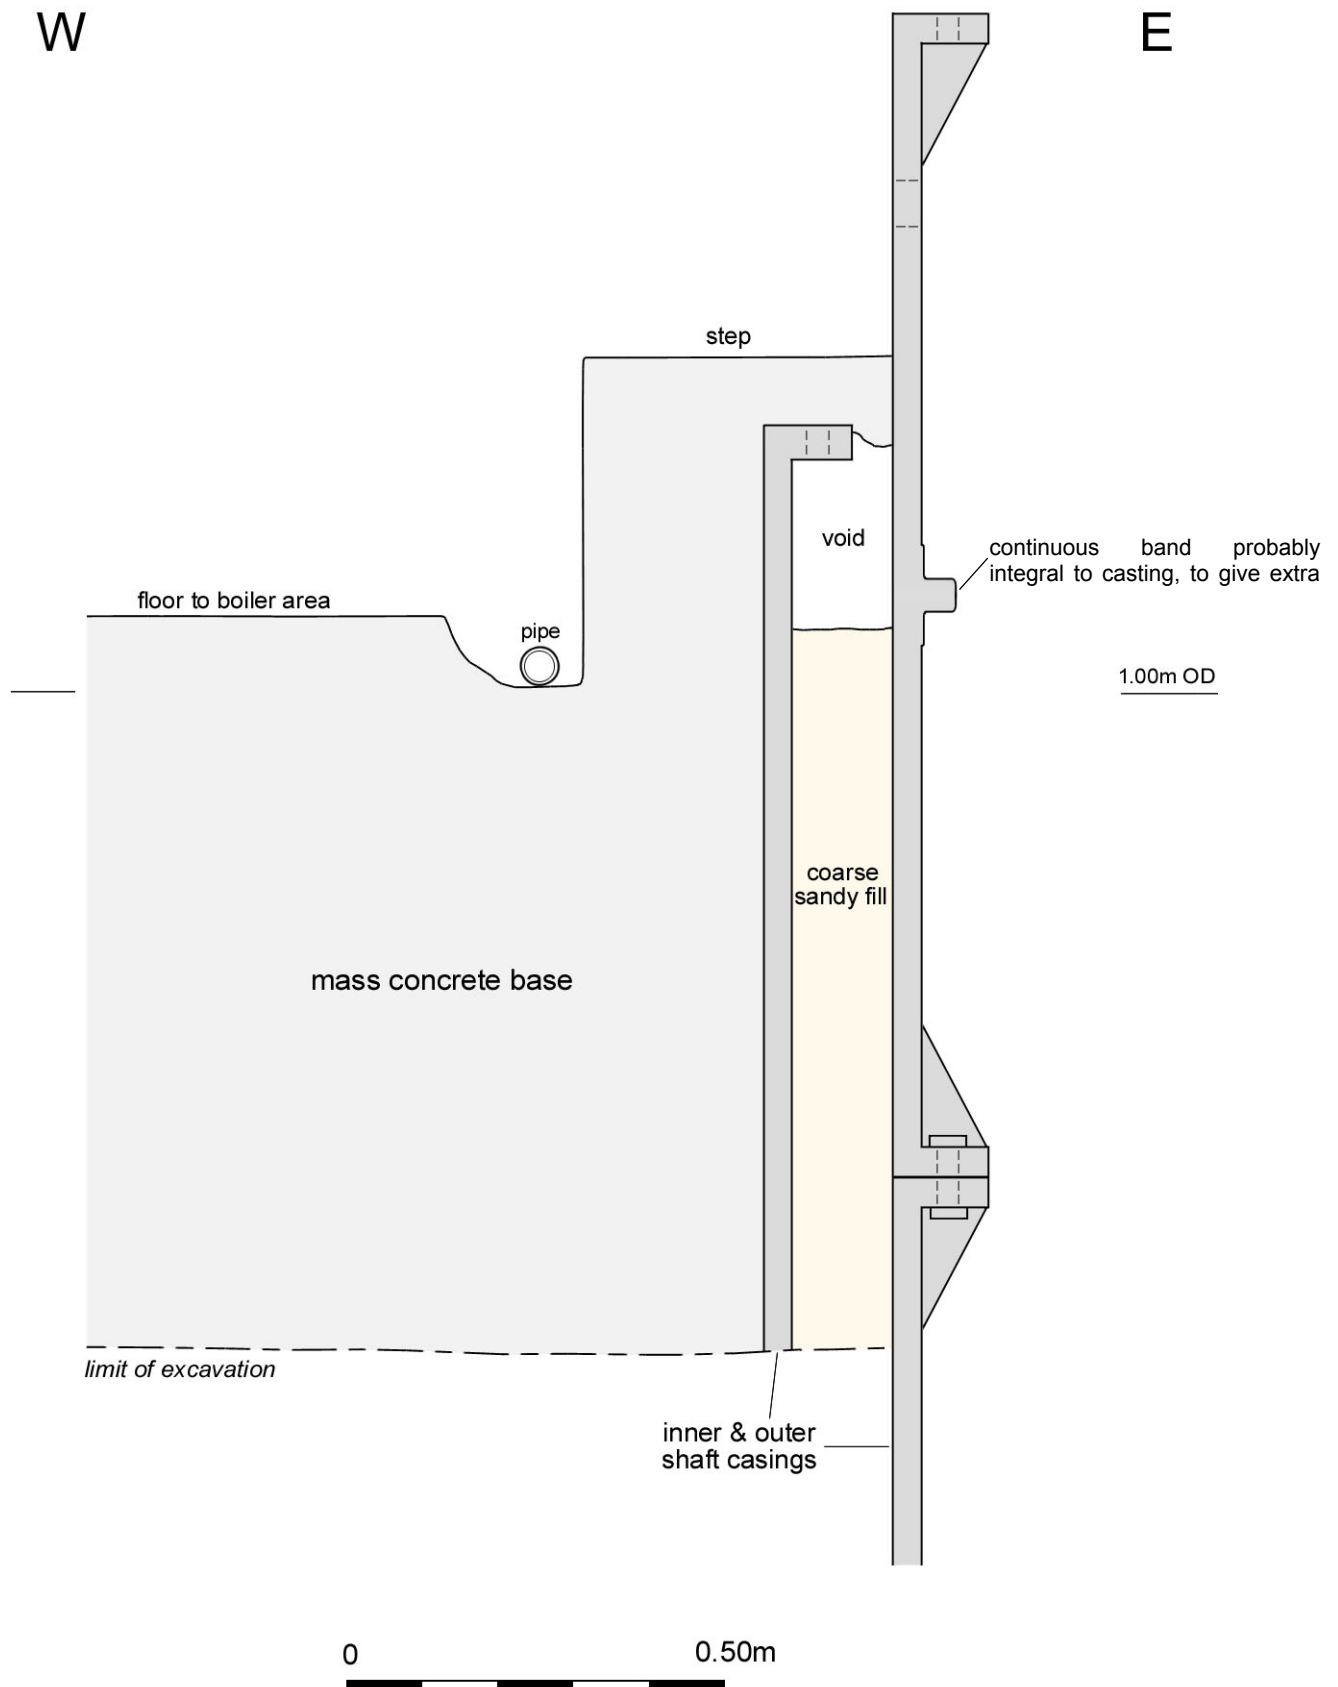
Section through one side of the western counterweight shaft showing the inner and outer cast iron casings or rings, the outer being exposed during demolition
